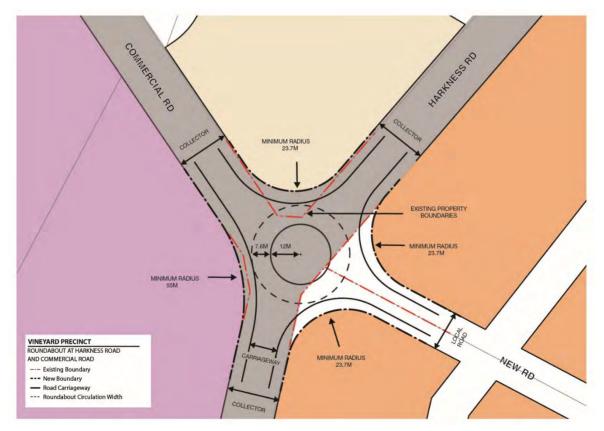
Indicative location and design of roundabout at Harkness Road and Commercial Road
